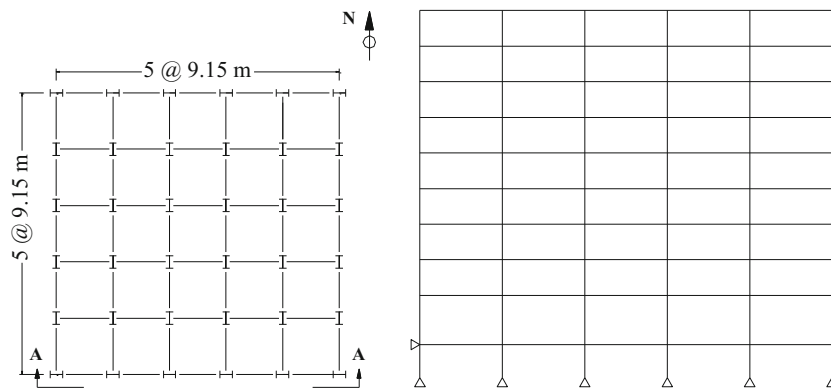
Plan and elevation of the nine-story steel frame building
